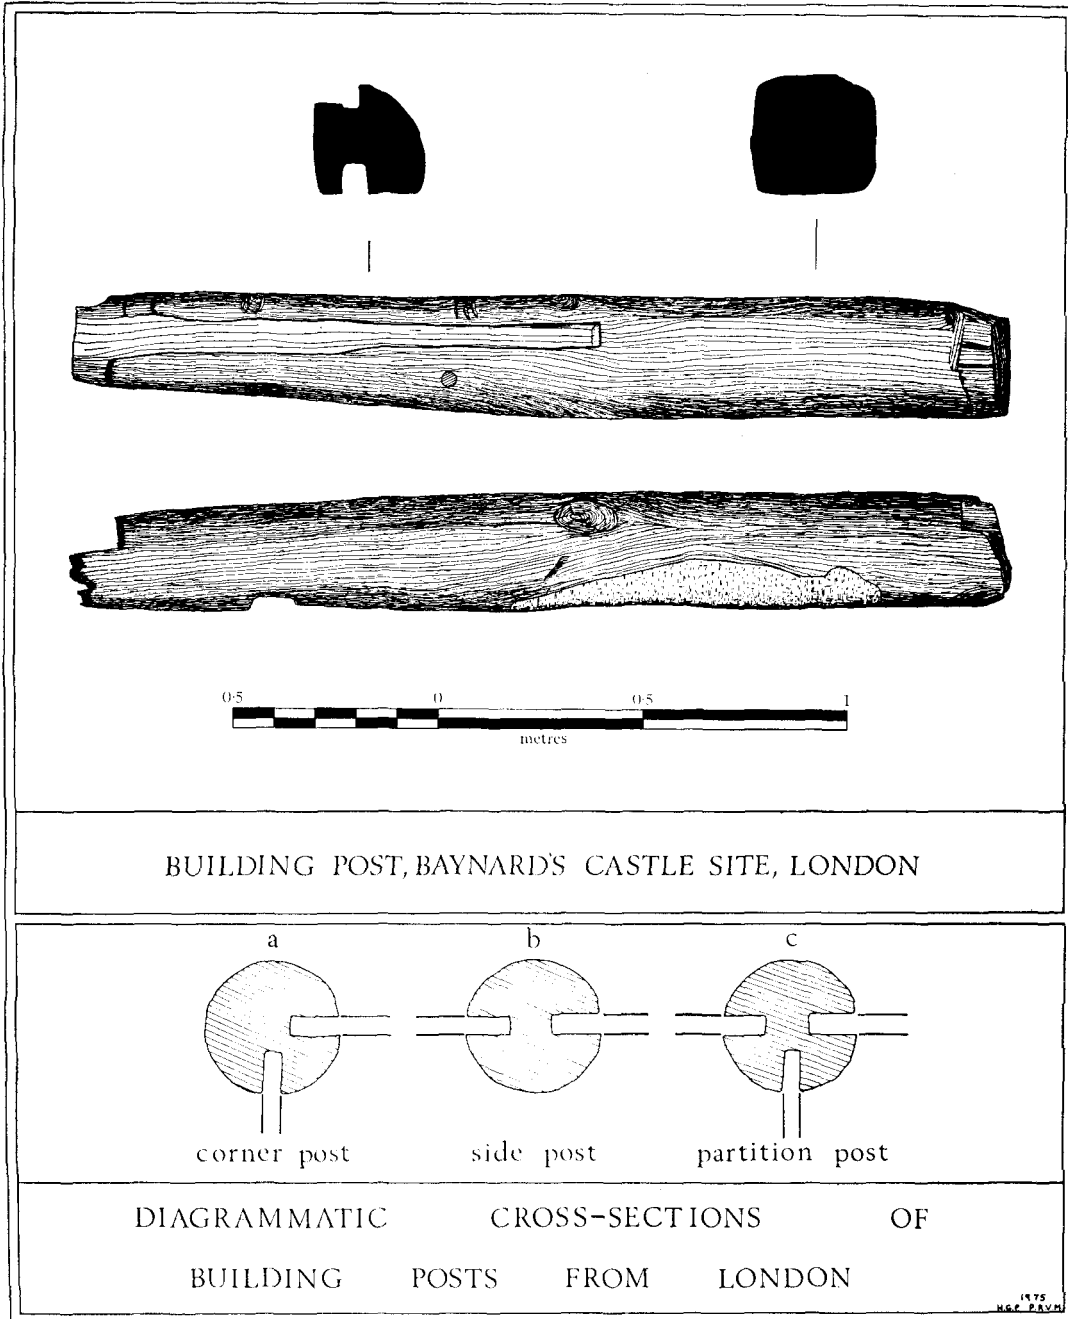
St. Mildred's Church. Building posts of Saxon type from London.
